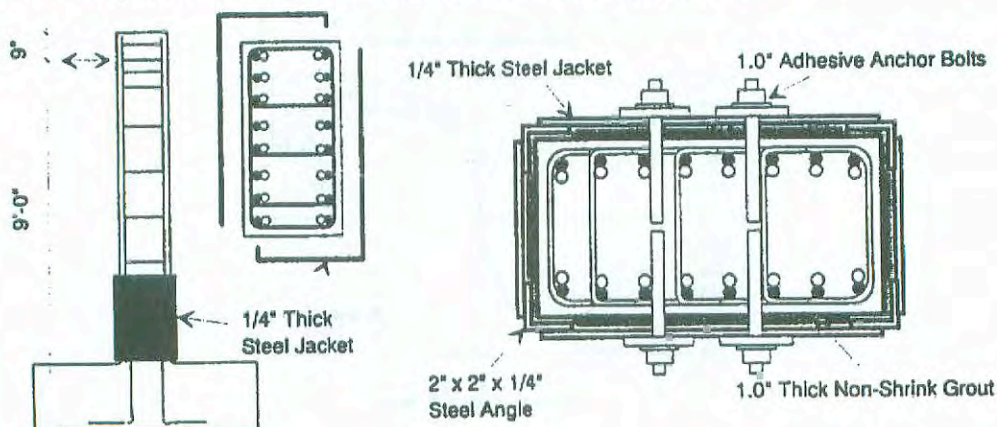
Steel jacket used by Aboutaha et al (1996 a,b) for retrofitting concrete column with insufficient lap splices
